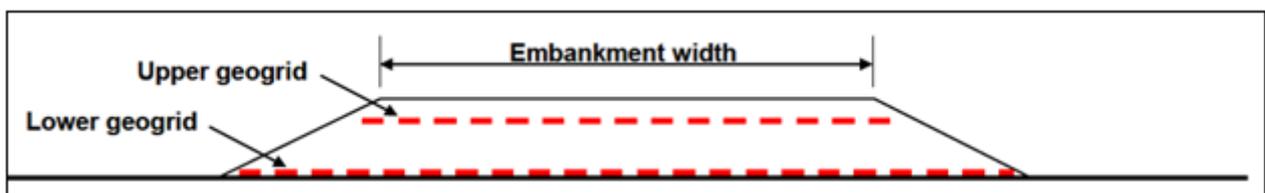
Typical Stabilised 'Floating Road' Cross Section with Geogrids
